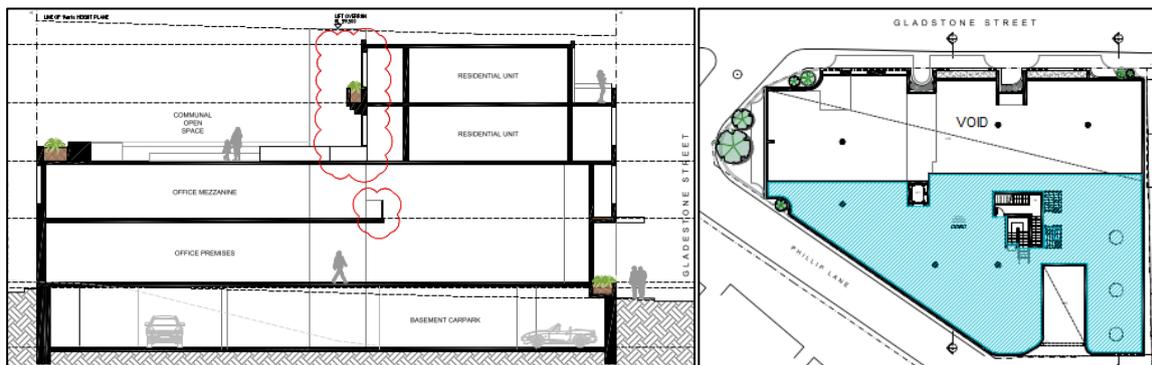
Approved plans – cross section and mezzanine/level 1 (GFA highlighted in blue)
